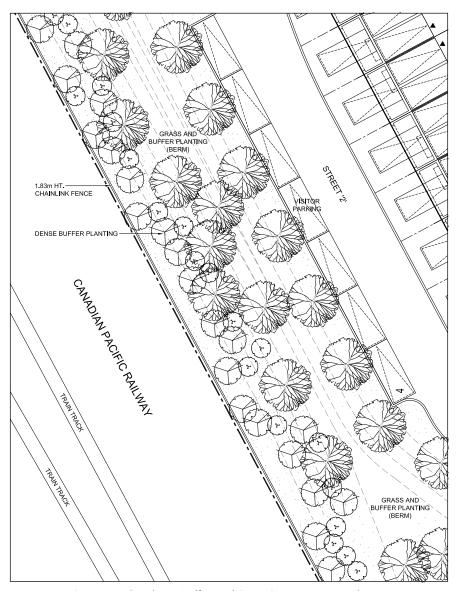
Conceptual Railway Buffer and Open Space Amenity Plan.
